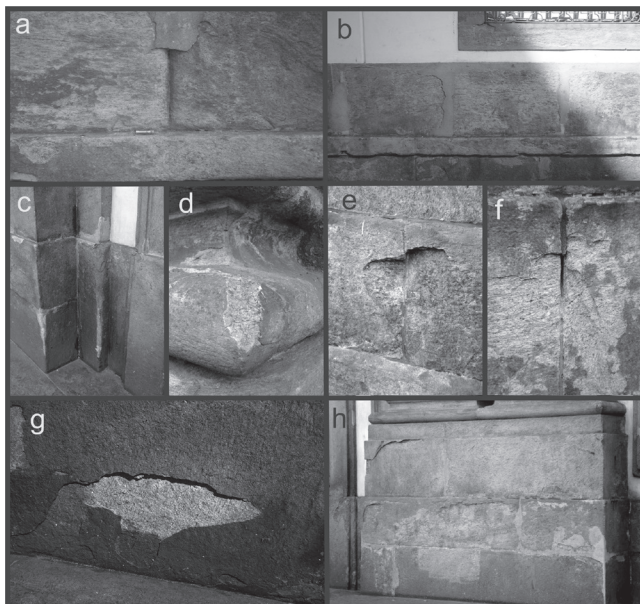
Photograph showing the main pathologies observed in the buildings on the street facing façade of near to street level.
